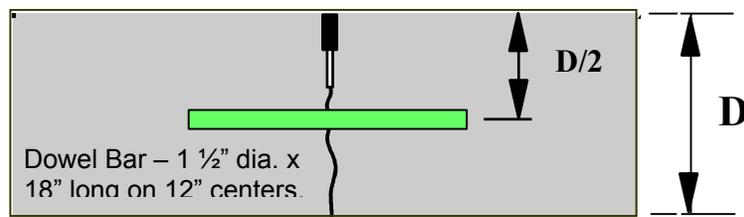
Transverse contraction joint. Note the crack contributing to aggregate interlock through the concrete section.
